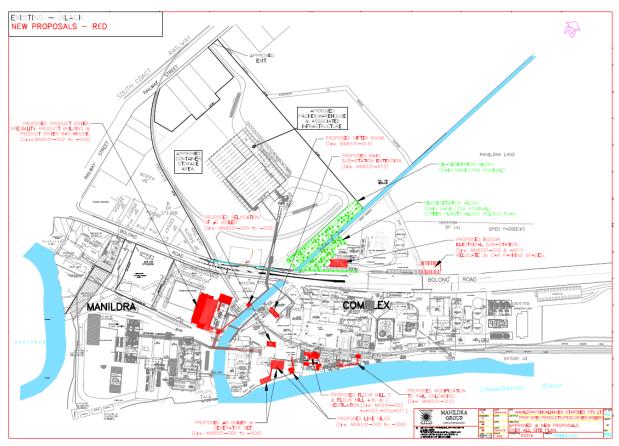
Overall Site Plan – Shoalhaven Starches, Bomaderry, NSW
